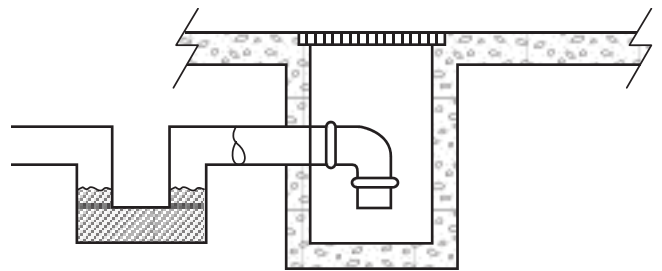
(e) Details of Liquid-Seal Trap.
